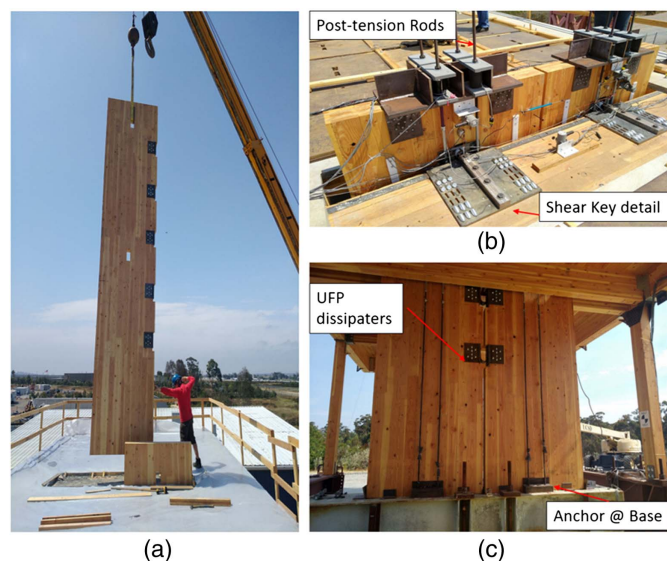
CLT rocking-wall installation and details: (a) installation of the CLT panel; (b) details on the top of the wall; and (c) details at the base and first story.
